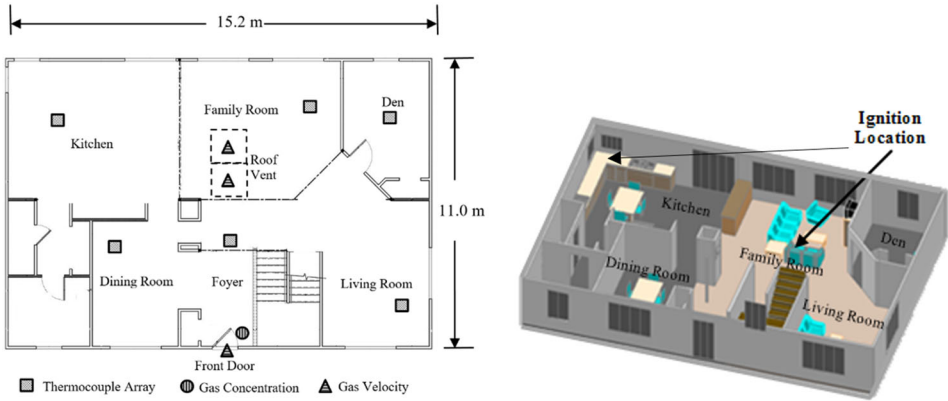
Two-story house first floor plan and 3D rendering showing furniture and ignition location.
